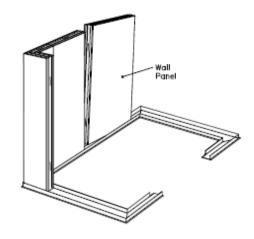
CAM LOCK WALL PANELS TO CORNER PANEL
